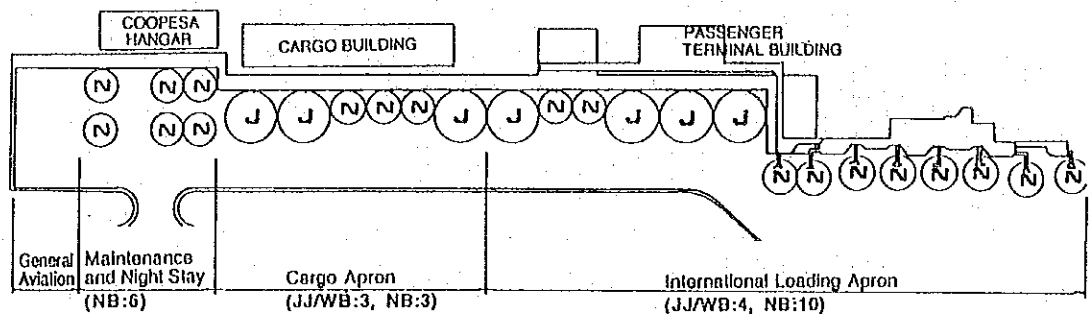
Alternative Terminal Area Development Plan (Alt. T-C)
